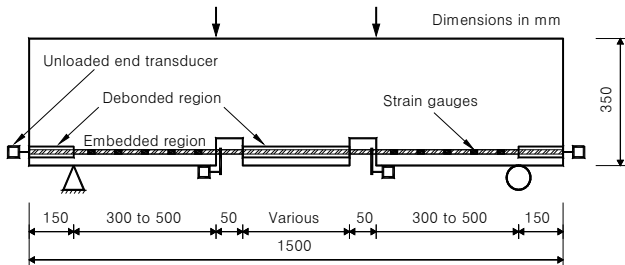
Schematic of beam anchorage test specimen (Noël and Parvizi, 2020)
